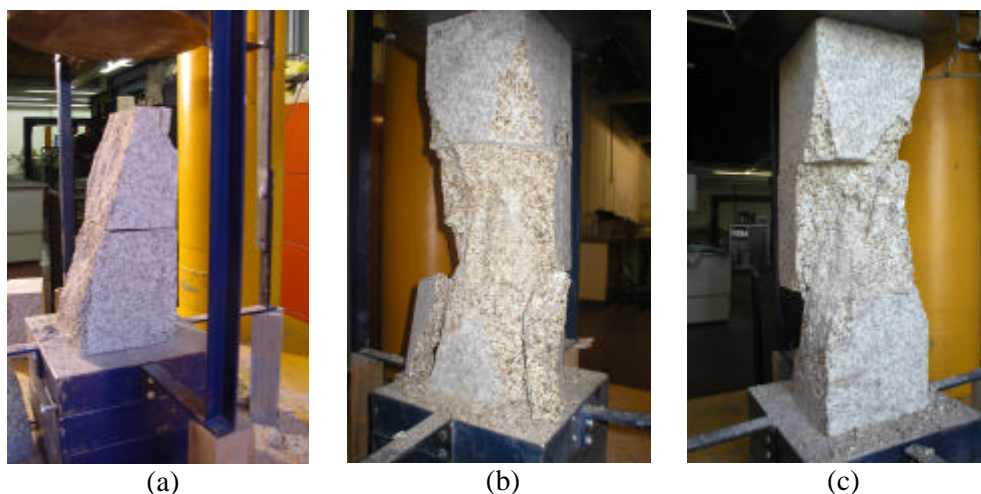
Characteristic failure patterns of dry masonry prisms; (a) specimen PR_S6; (b) specimen PR_SR5; (c) specimen PR_SR4
